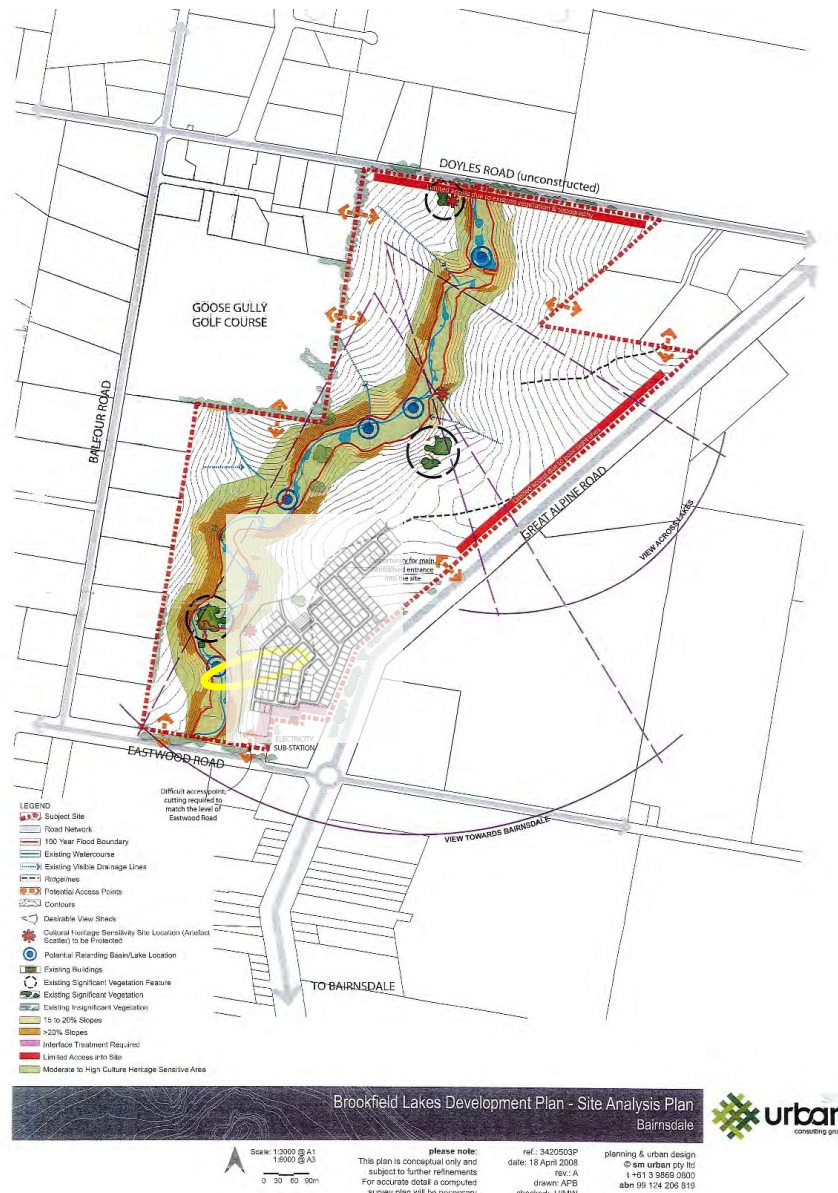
Site Analysis Plan⁵ / Concept Site Layout Nov 2023 Overlay
